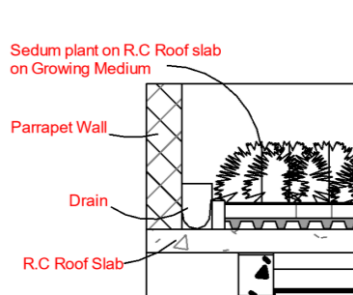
Detail of the green roof components at the roof drainage. (Source: MDG Projects, 2023)
